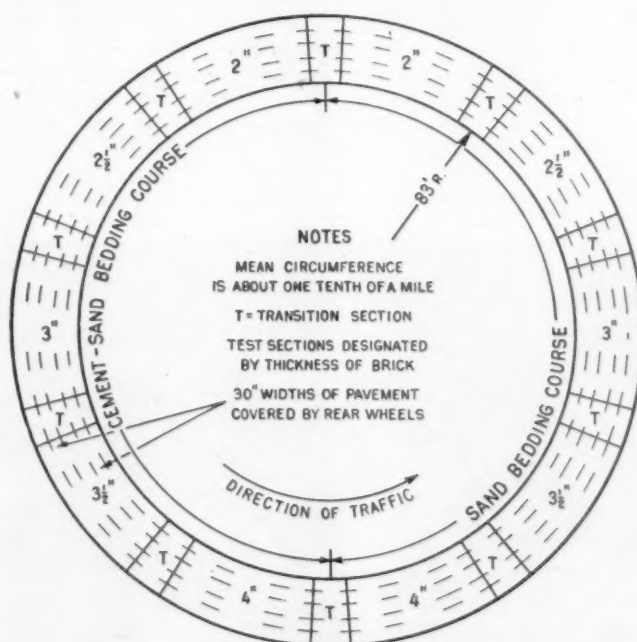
GENERAL PLAN OF BRICK TEST TRACK
